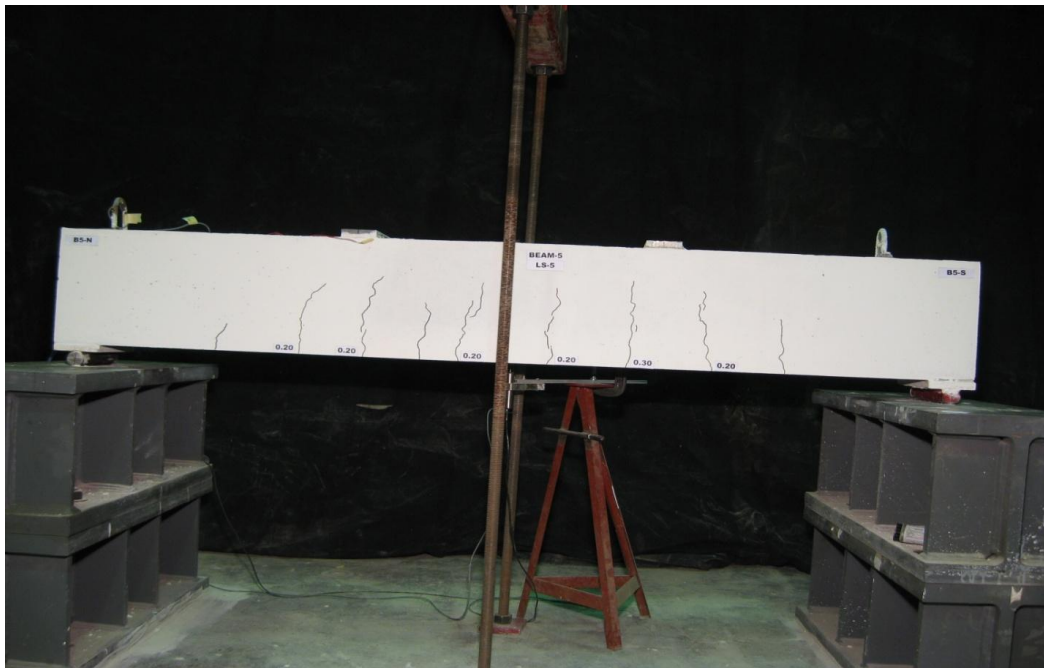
Cracking pattern for beam 5 at a load of 64.63 kN (B5-LS5)
